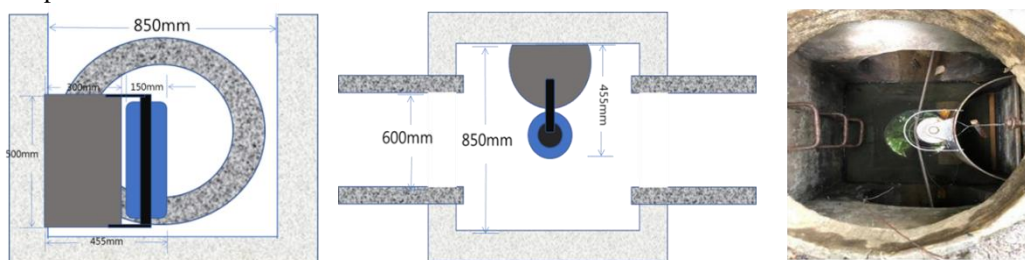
Steel roller installed on sidewall of manhole chambers.
